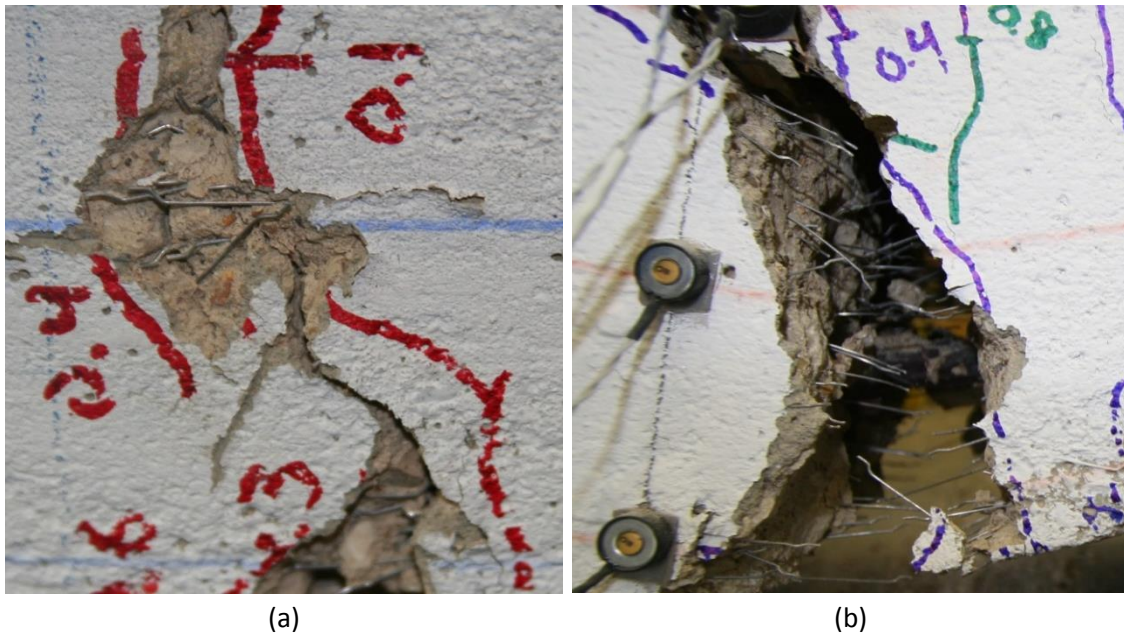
Steel Fiber Failure (a) Spalling at Surface of Concrete - E2 S9005BTM23 (b) Steel Fiber Anchorage Failure
